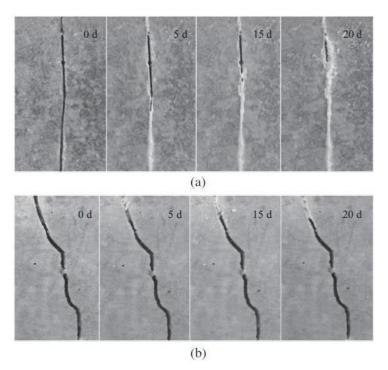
Crack healing in bacteria-based specimens over time: (a) specimen with crack width of 0.3mm; (b)) specimen with crack width of 0.8mm, Mian et al 2015.
